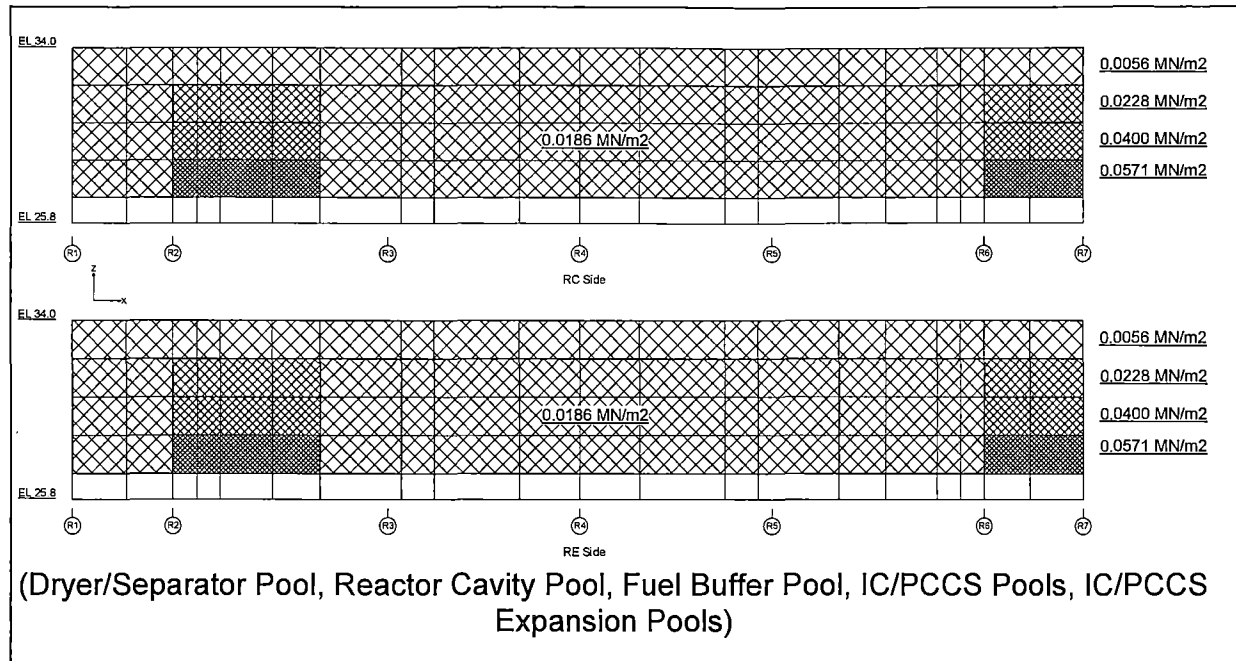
Hydrostatic Loads on the Pool Girder
